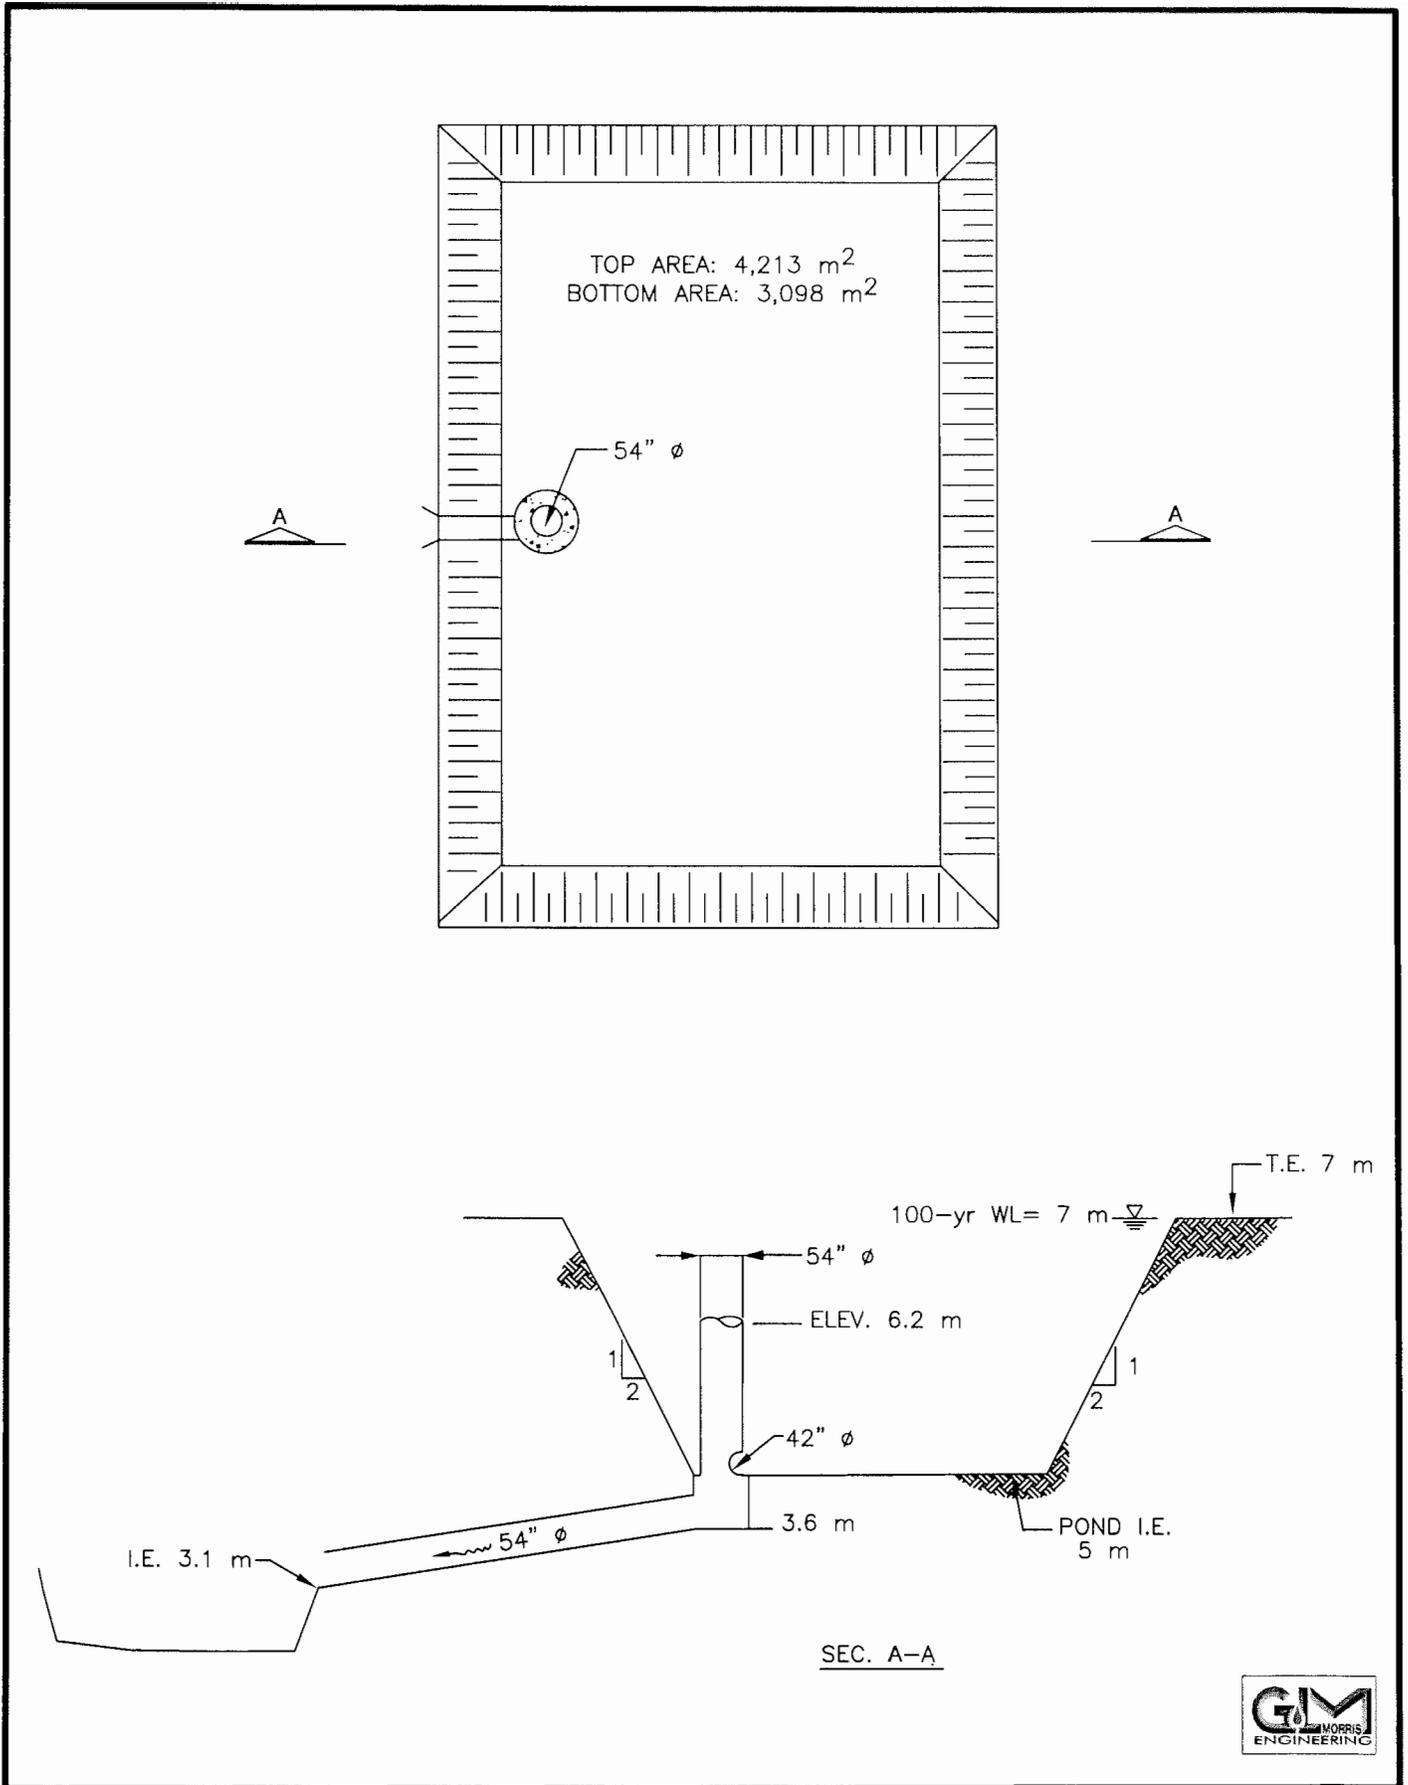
Schematic drawing of proposed detention pond and outlet structure for "Pond NW"
